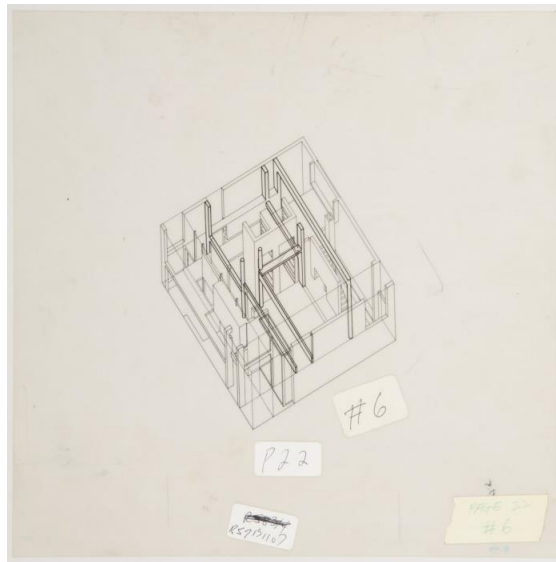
House 1, Princeton, New Jersey: Exterior axonometric, 1967. Peter Eisenman Fonds, Canadian Centre for Architecture, Montreal.
